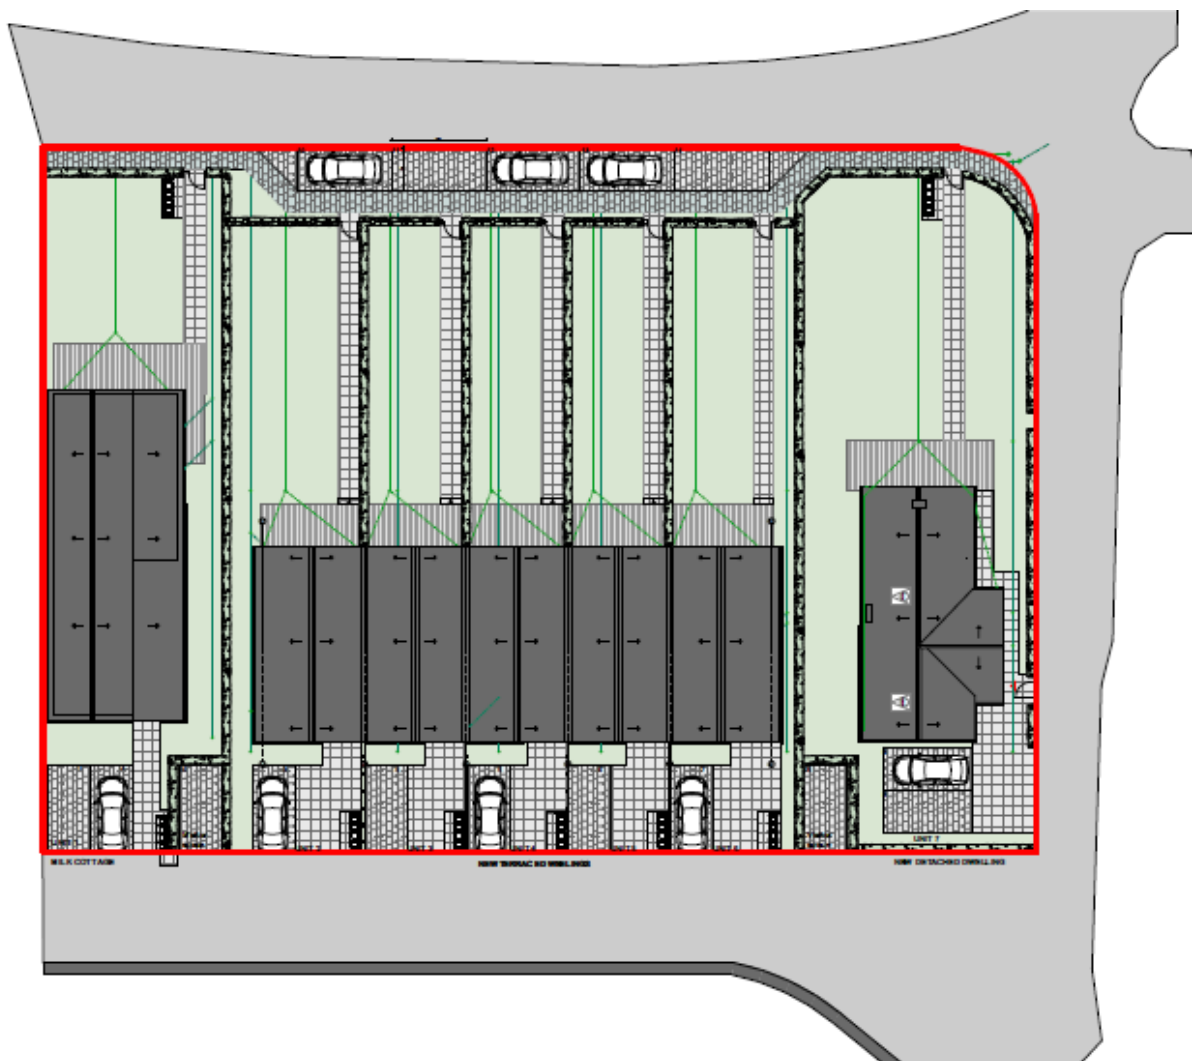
Proposed Site Plan (extended Milk Cottage to left, terrace of 5 units in centre and detached single dwelling to right)
